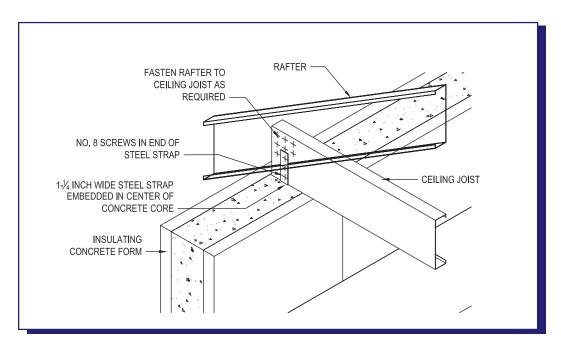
Steel Strap Connection at Wall Parallel to Ridge
